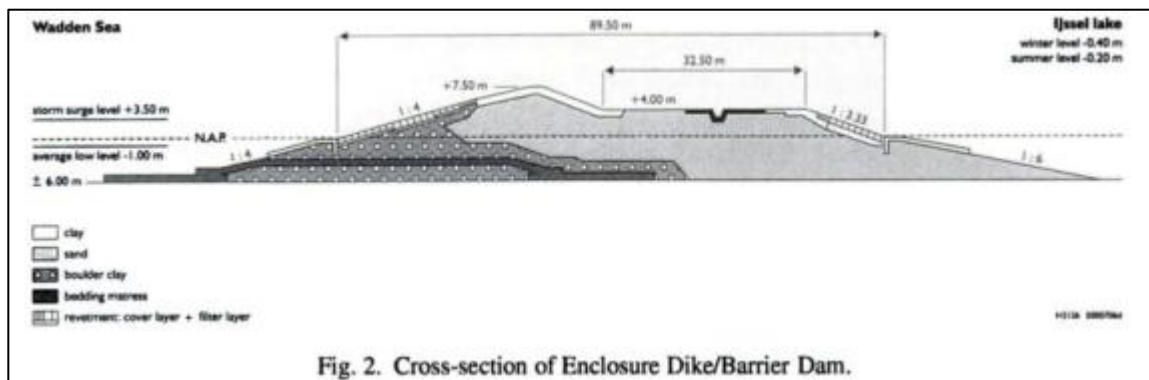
Cross-section of Enclosure Dike/Barrier Dam.
